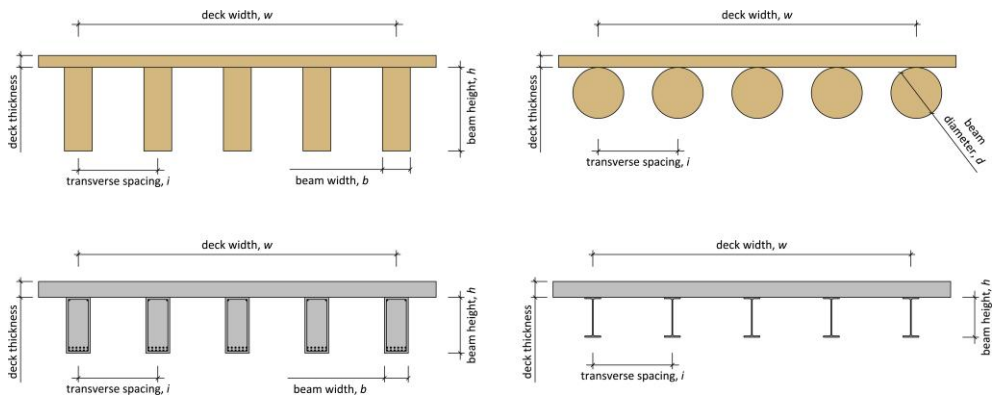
Cross-sectional views associated with the constituent materials: solid timber with a transversely deformable deck, reinforced concrete with a transversely rigid deck, and steel with a transversely rigid deck
